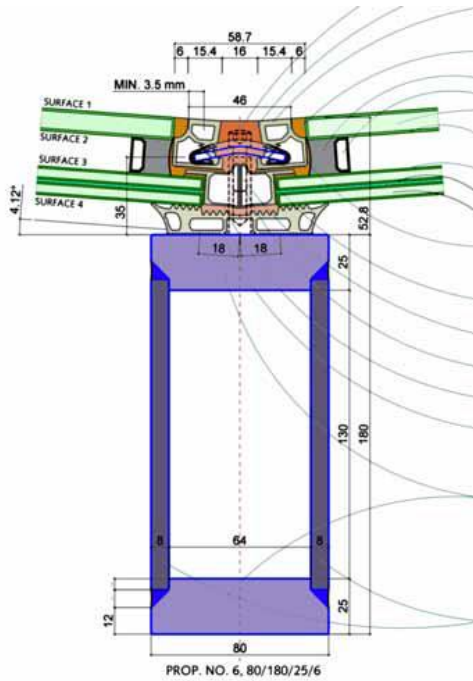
Detail of the structural members (Sischka & Biro, 2008)
